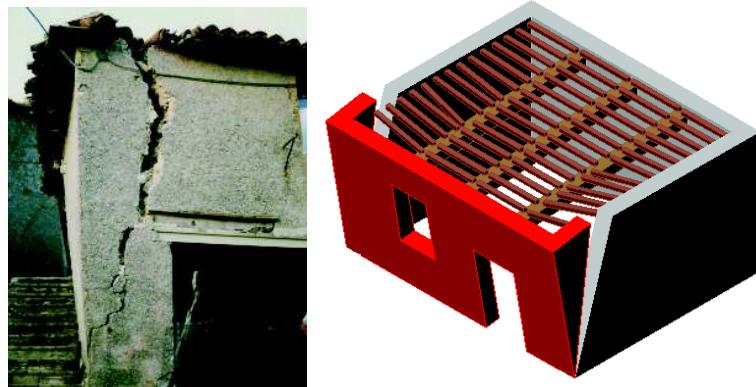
In this masonry building it is possible to see the overturning of the wall caused by a poor connection of the roof to the wall.
